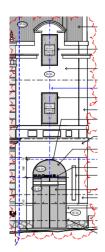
Extract of drawing A3-200 from HV01 set for application, proposed western (front) elevation. Source: Trethowan Architecture, 2025.
